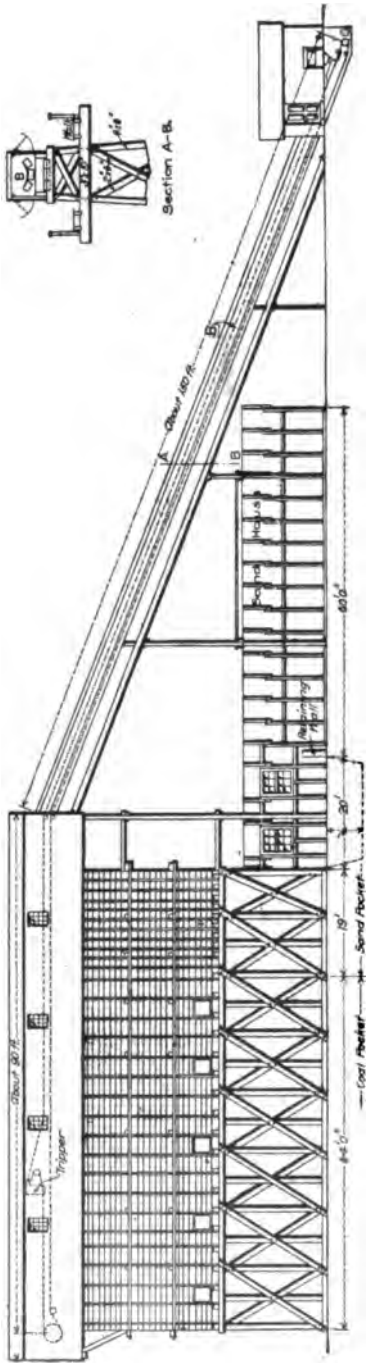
Side elevation of Elizabethport coaling plant—Central of New Jersey.
